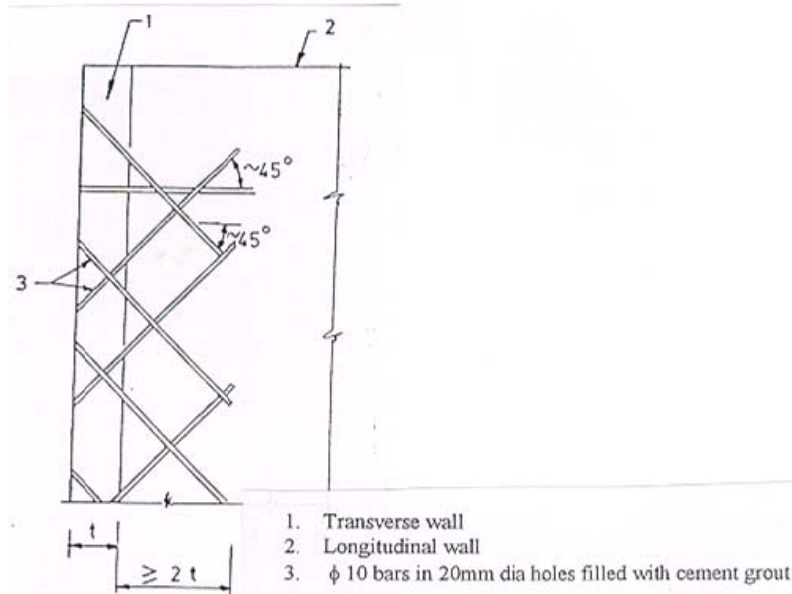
Stitching of transverse walls with inclined bars [3].
